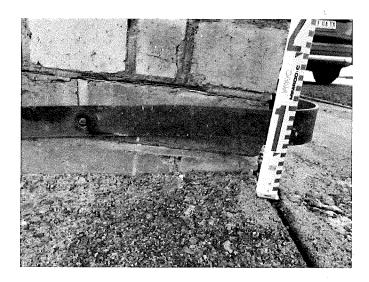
ACMA Facility main building Roof bonding earth strap detail.
